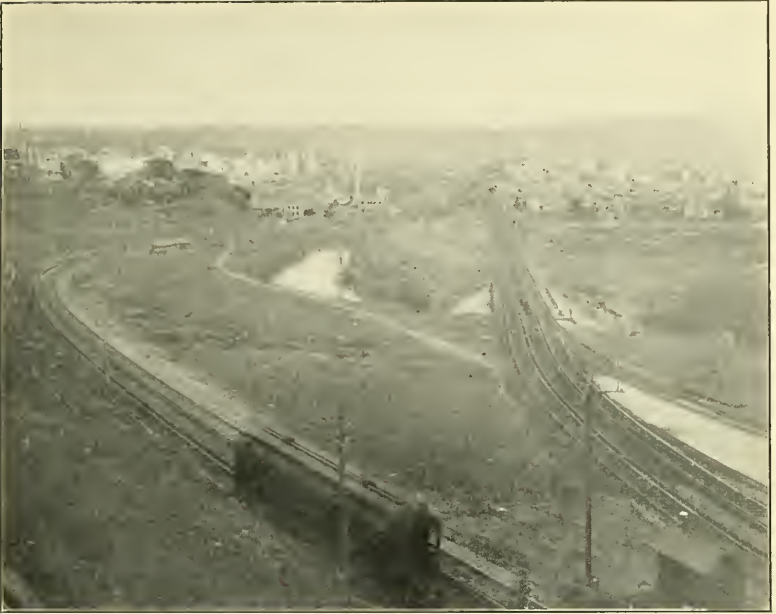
NORTH APPROACH, SCRANTON TUNNEL. TUNNEL LINE ON LEFT. TEMPORARY LINE ON RIGHT.
